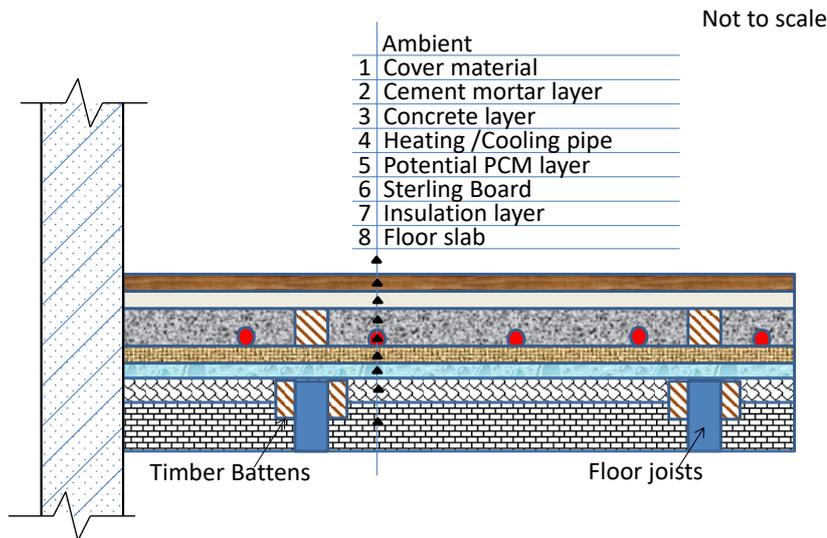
A schematic diagram of underfloor heating system structure with potential layers and joists (Huang et al., 2015)
